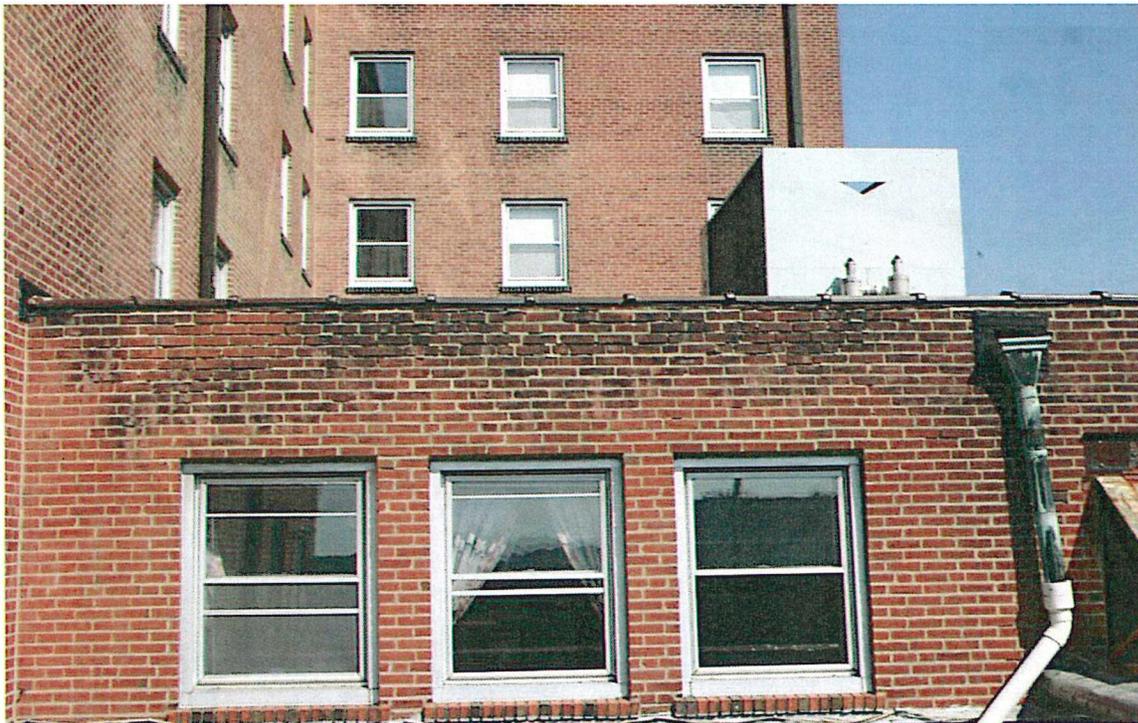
View of south wall of Third Floor Roof. Note masonry distress.
